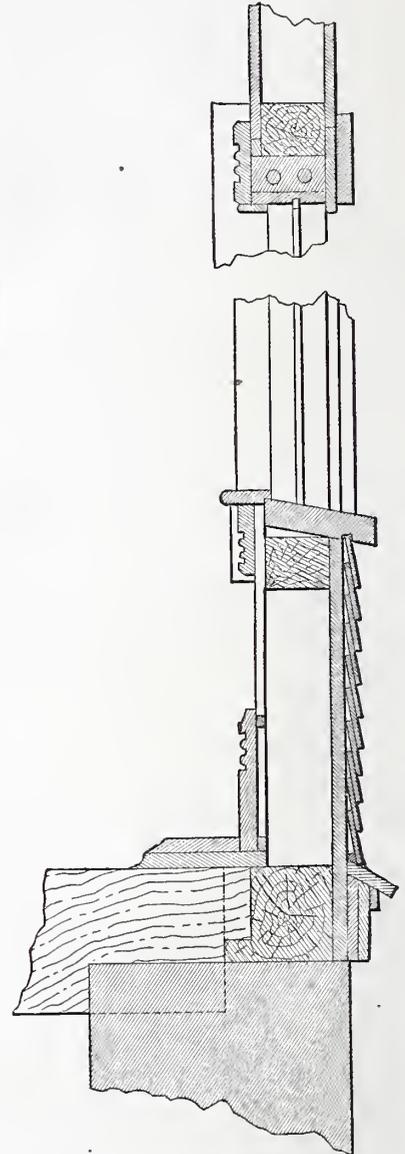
Vertical Section through Window.—Scale, $\frac{1}{2}$ Inch to the Foot.
